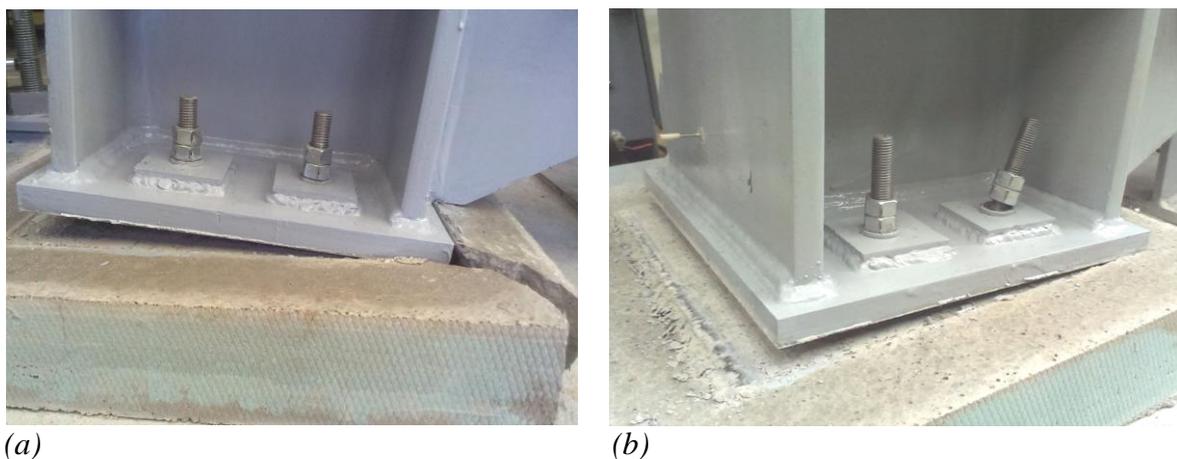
Failure mechanisms: (a) regular grout; (b) fibre-reinforced grout
